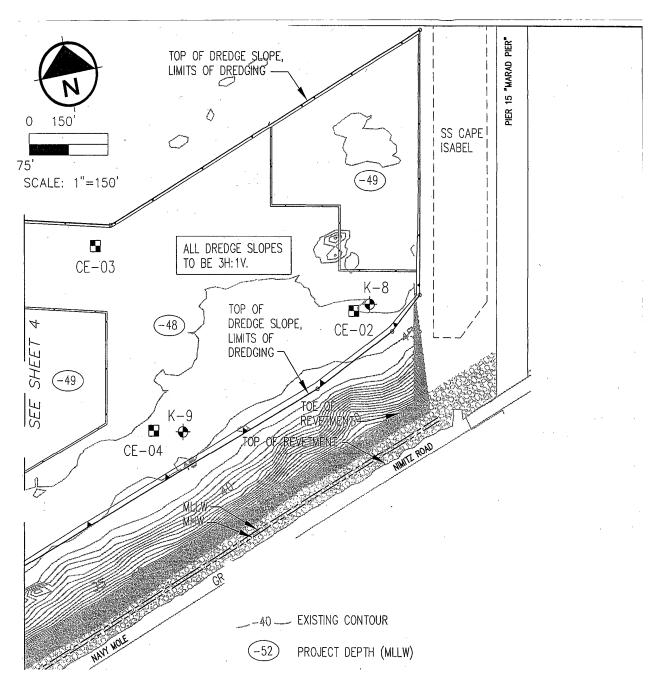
Dredging plan for AOEC-C West for IR Site 7.
